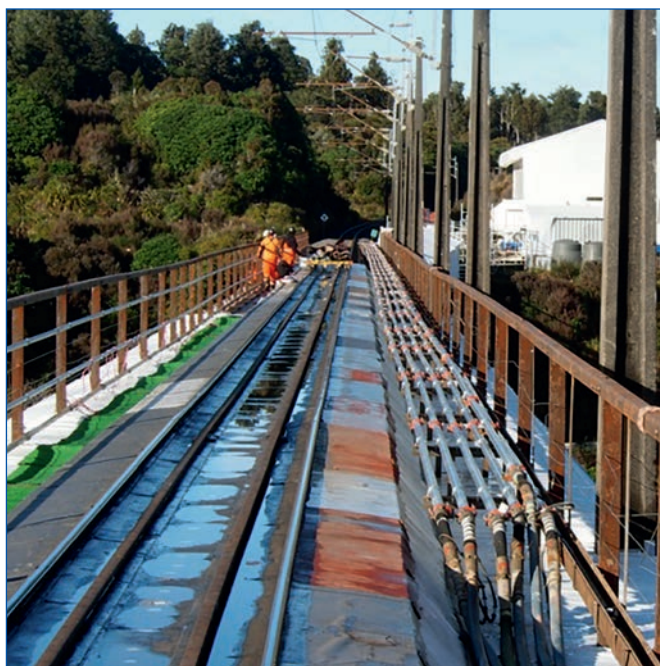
Water Proofing of rail deck, blasting lines on deck and blasting plant building in background.
